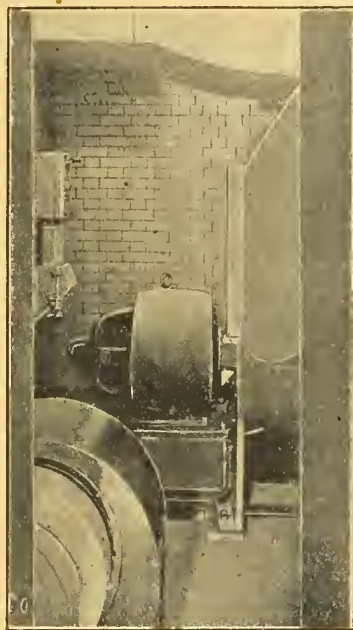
VENTILATING PLANT IN BASEMENT.
